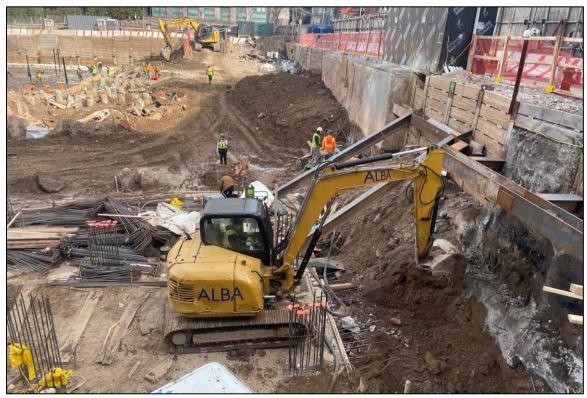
Excavation of shoring support, exposing stratigraphy, Area A3, facing north.
